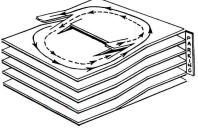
STAGGERED FLOOR, DIVIDED, ONE-WAY
